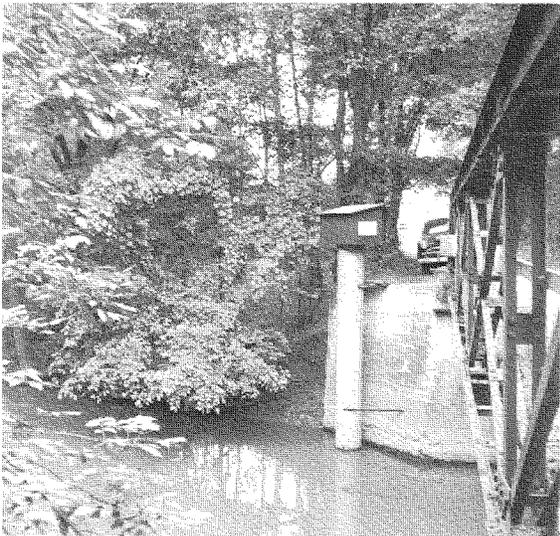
Steel-pipe well and look-in shelter attached to bridge abutment.
